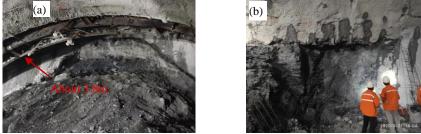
Actual collapses during tunnel excavation (a: collapse on the left arch; b: collapse on the right-side wall).
